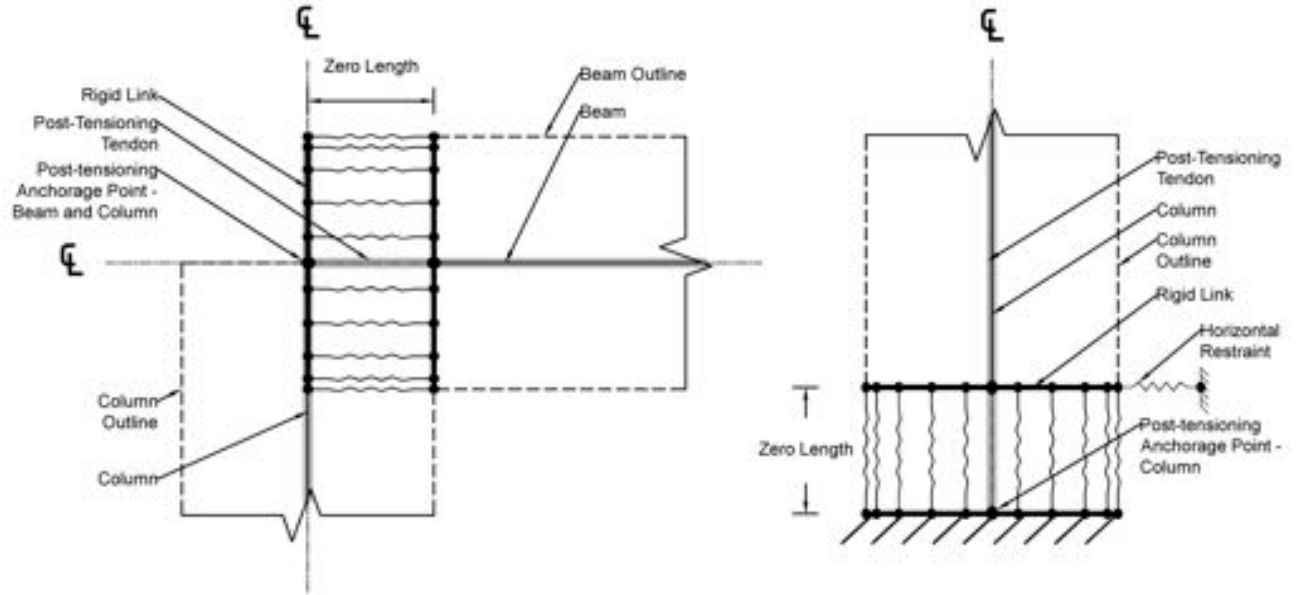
Beam-column connection (Left); Column-foundation connection detail (Right).
